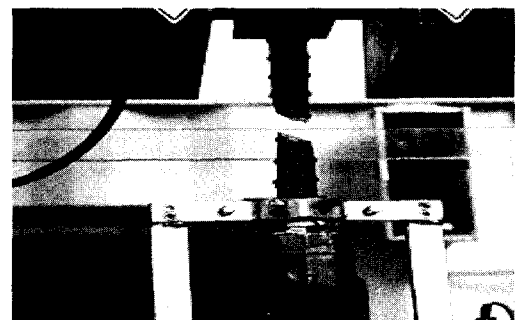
Fracture of rebar (Specimen 3838DM)
